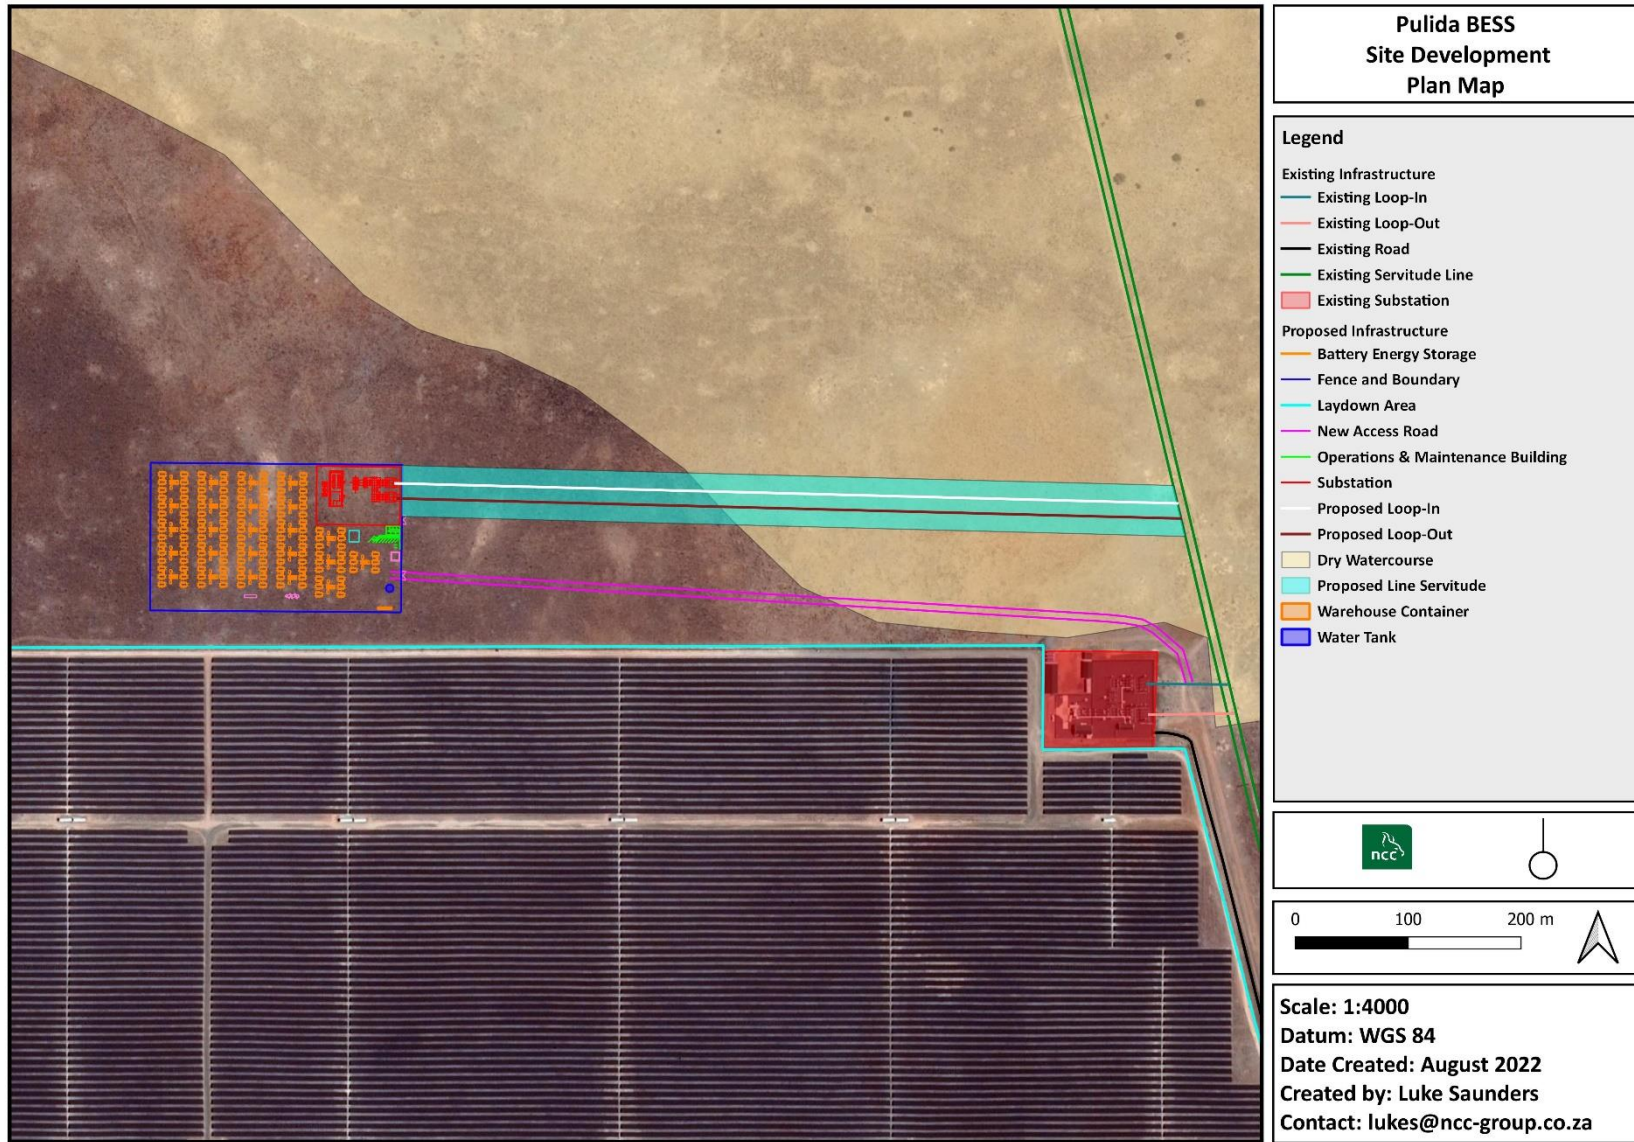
Site Development Plan (Option B – Loop In & Loop Out)
